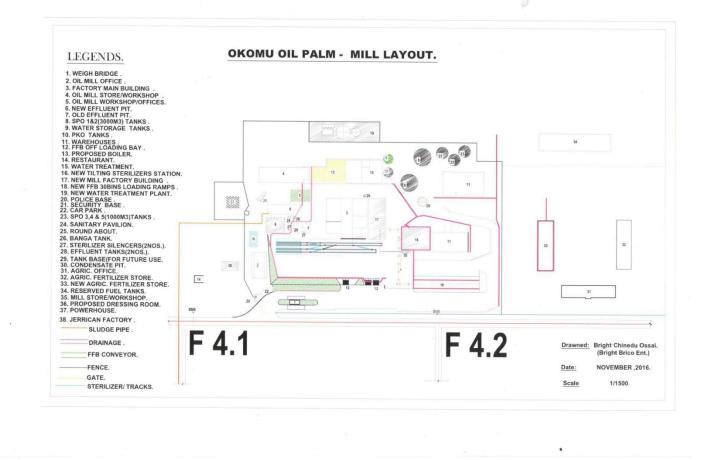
Technical Drawing of Expanded Palm Oil Mill Complex Layout
